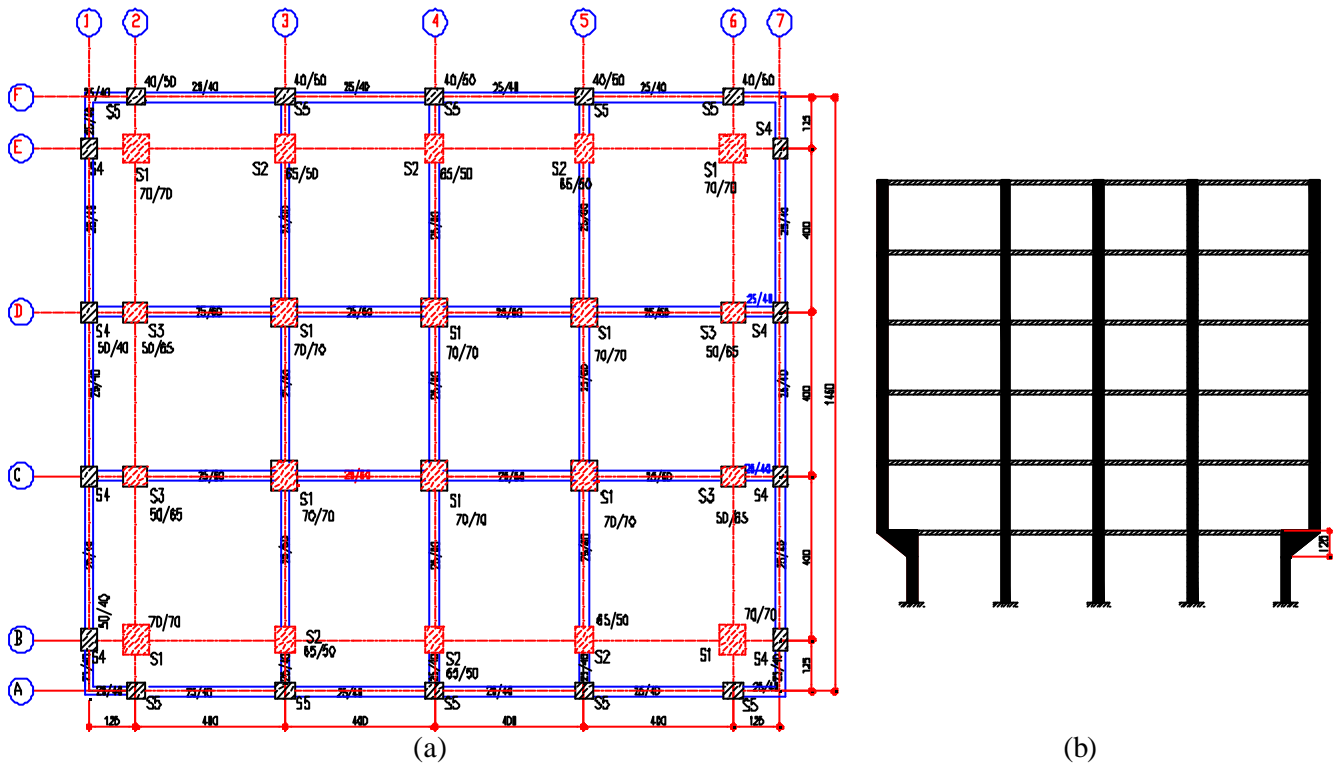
Slab plan (a); and elevation of the vertically irregular building (b).
